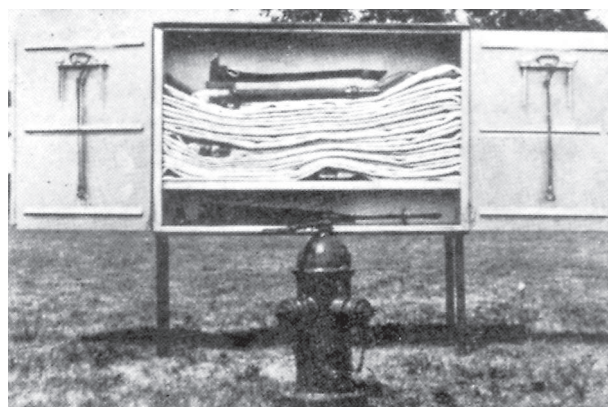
(b) Closed Steel Hose House of Compact Dimensions for Installation over Private Hydrant, in Which Top Lifts Up and Doors on Front Open for Complete Accessibility.
